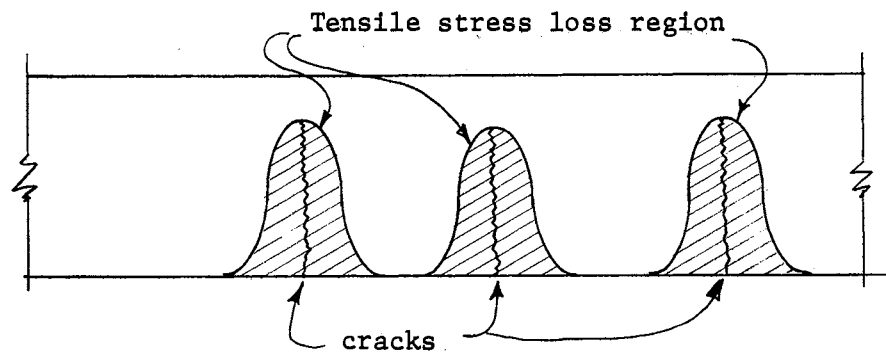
Loss of Tensile Stress in Concrete Either Side of Crack in Beam Subjected to Flexural Stress
